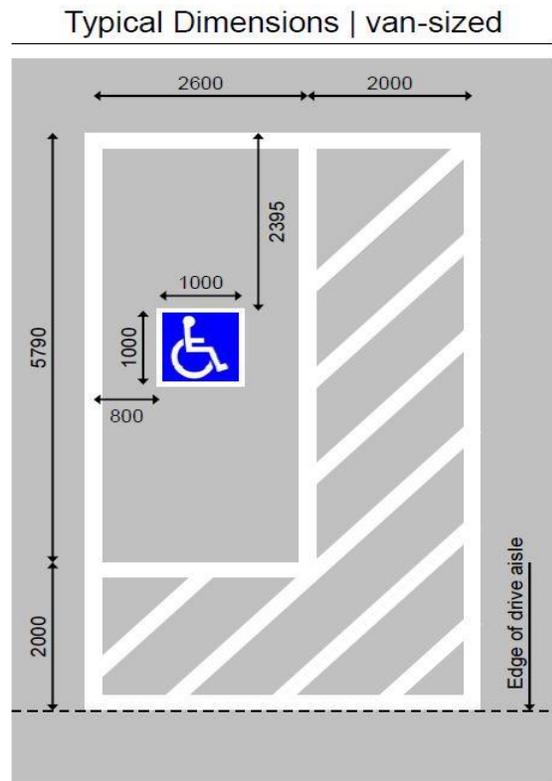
Off-Street Accessible Parking Dimensions and Layout
